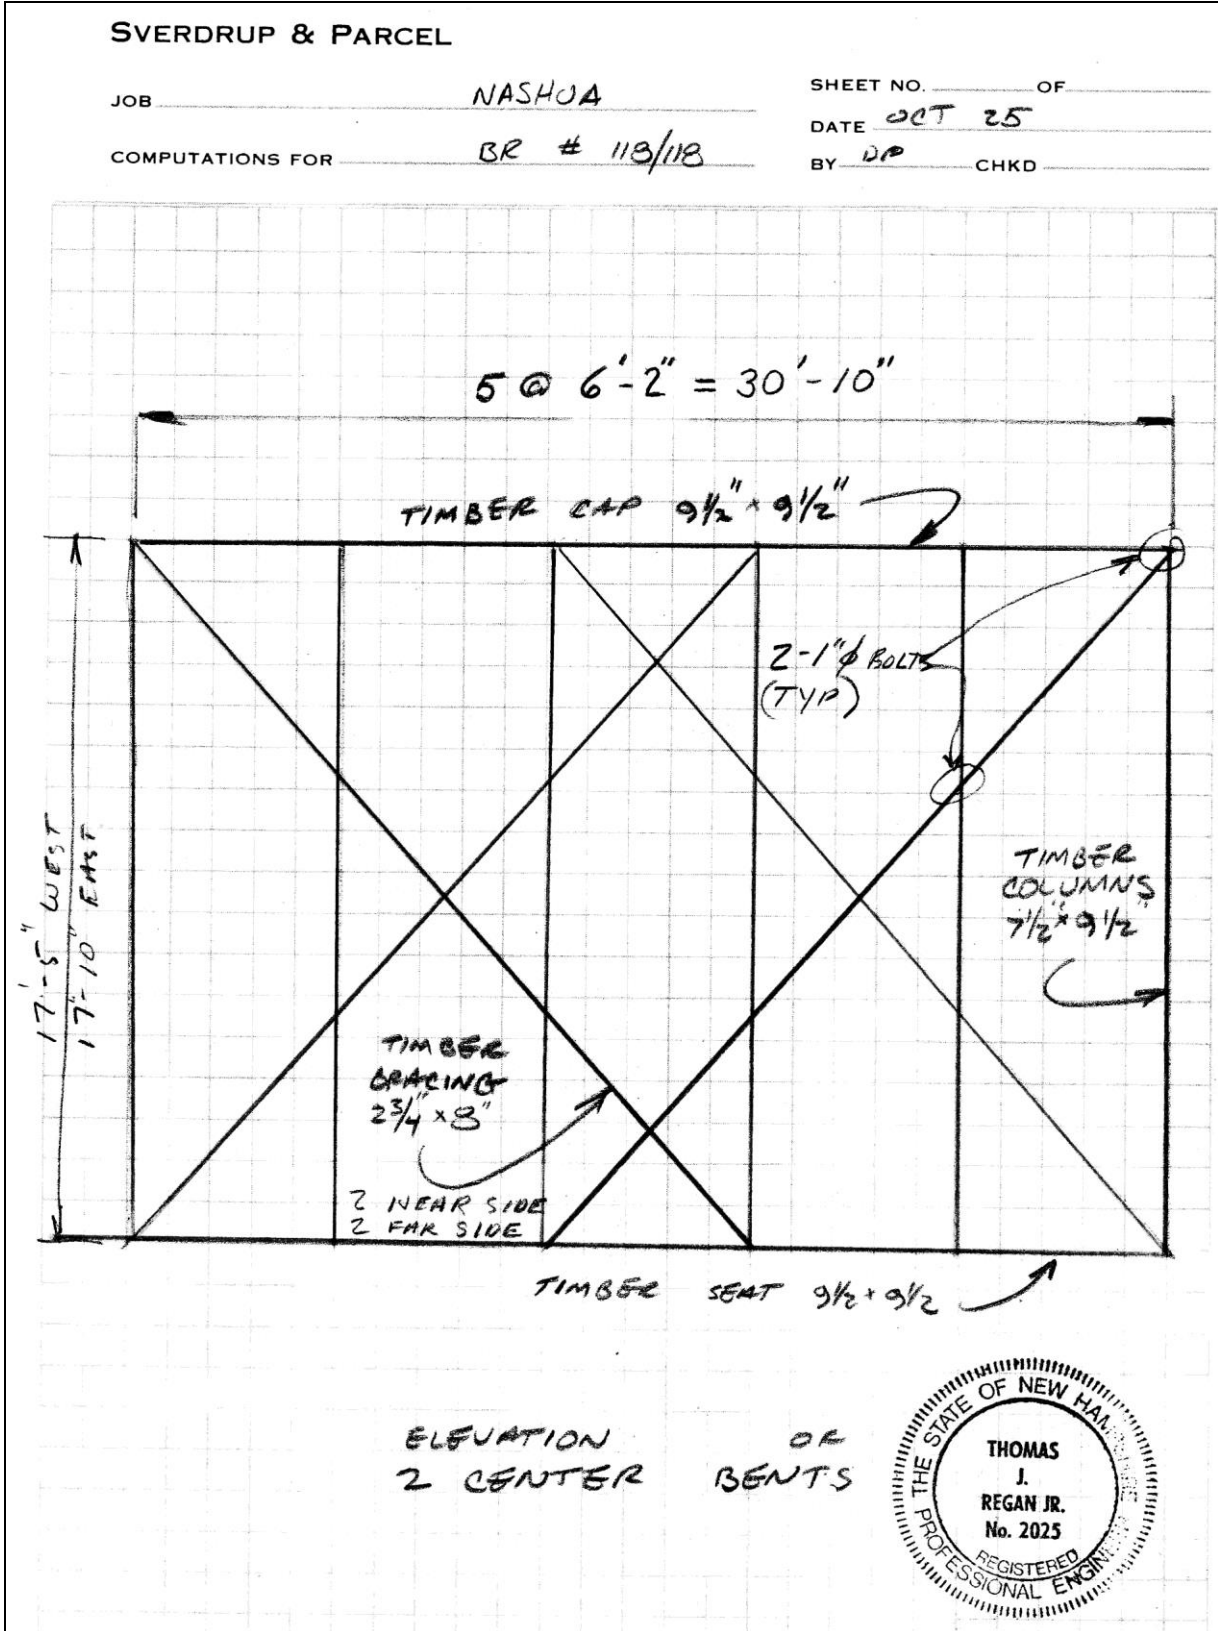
Fairmount St. Bridge Engineering Inspection Sketch by Thomas Regan, Jr. CE, Sverdrup & Parcel Engineers, October 1979 (NHDOT Bridge Inspection File).
